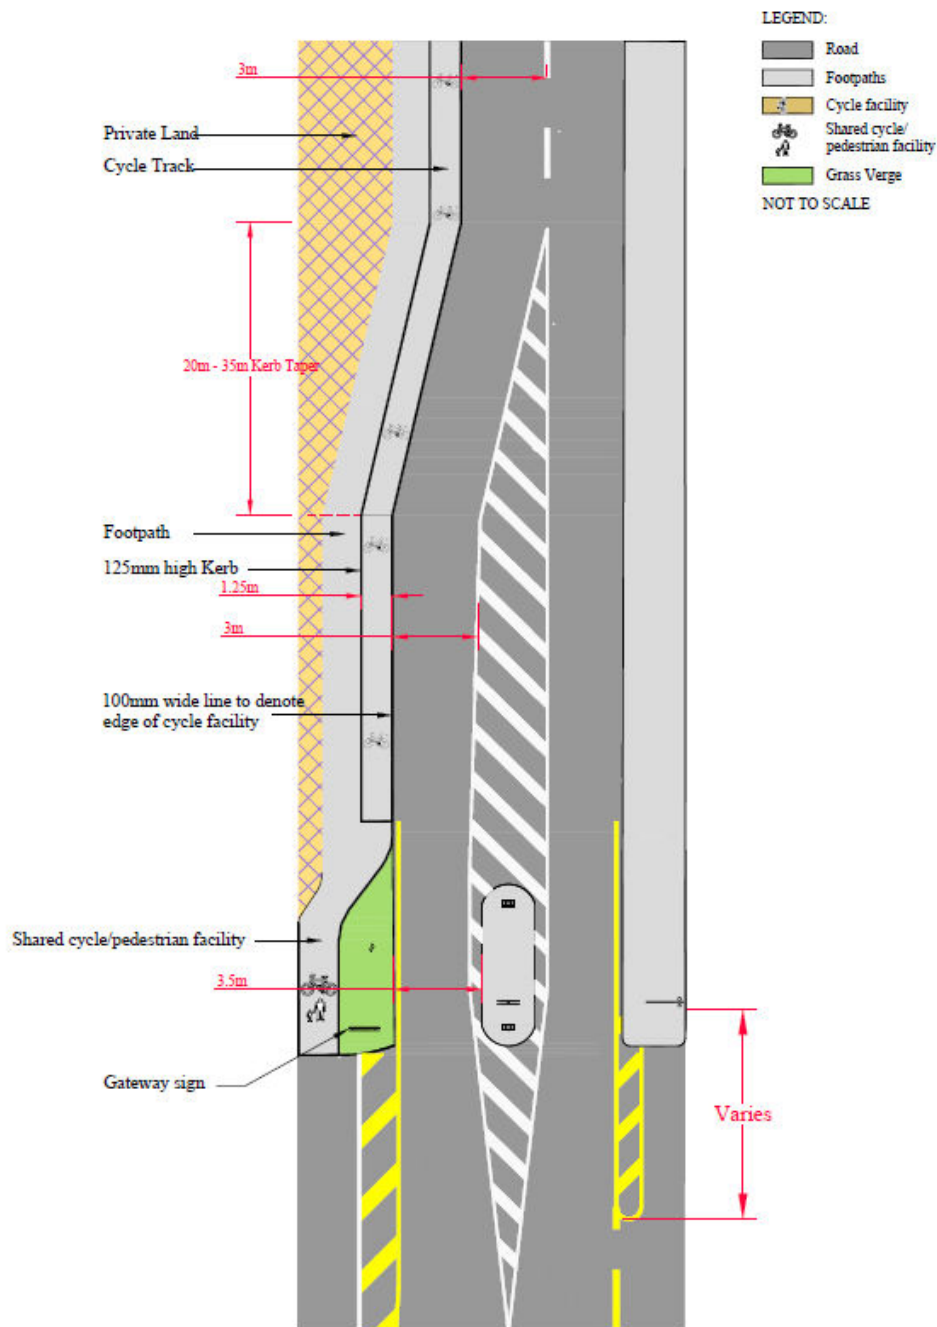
Plan of Cycle Bypass at Gateway Source: DN-STY-00000 (draft)
